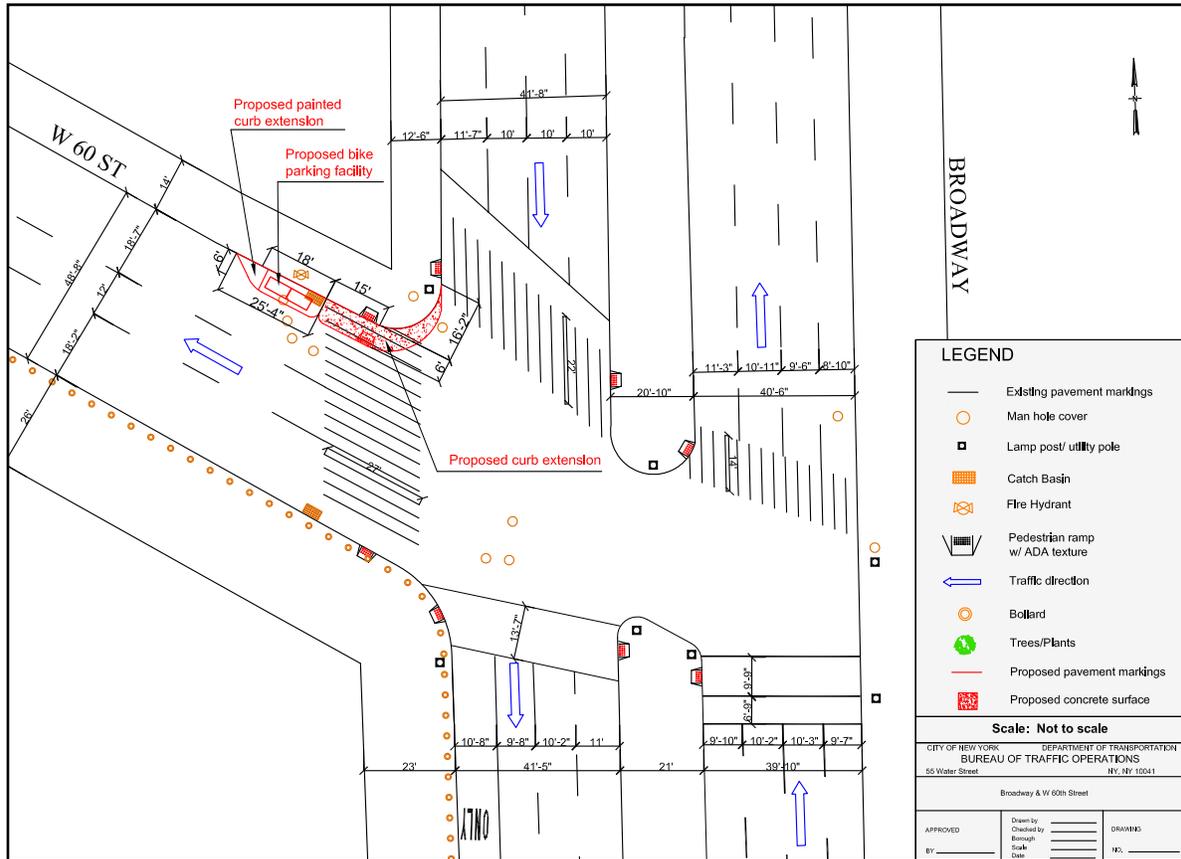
Proposed On-Street Bicycle Parking – West 60th Street & Broadway
